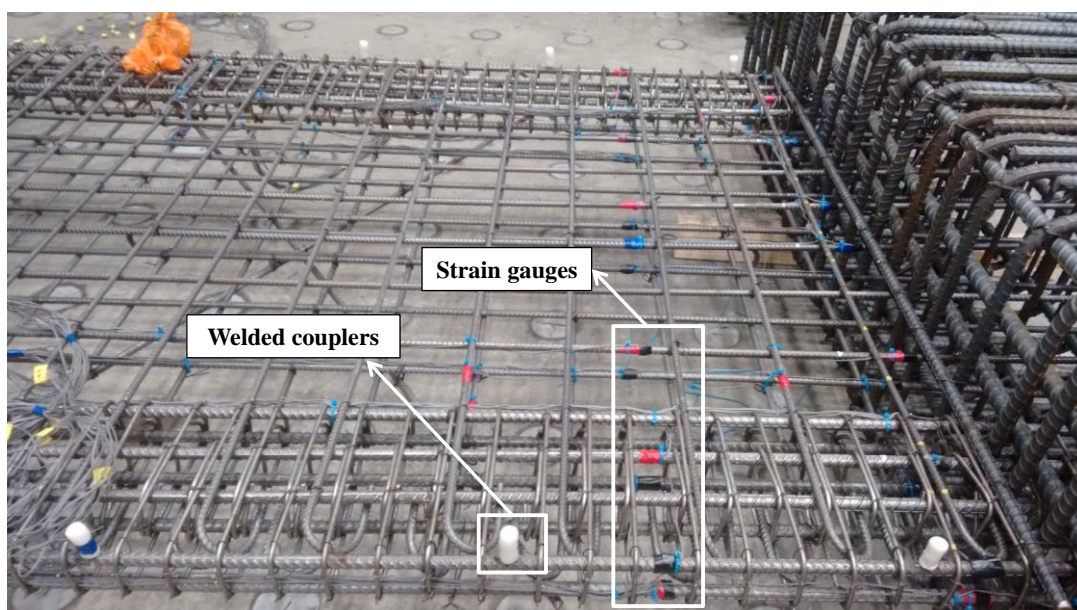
Attaching strain gauges and welded couplers in the lab before sending the cages for casting
